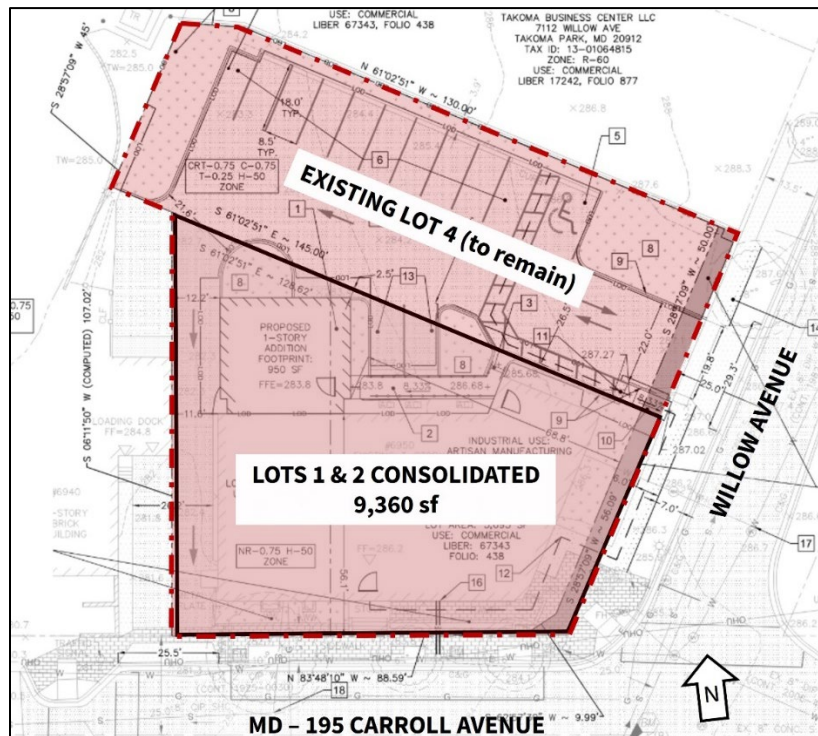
Proposed Subdivision Waiver Plan SRW202502 showing consolidations of Lots 1 and 2 in black outline
